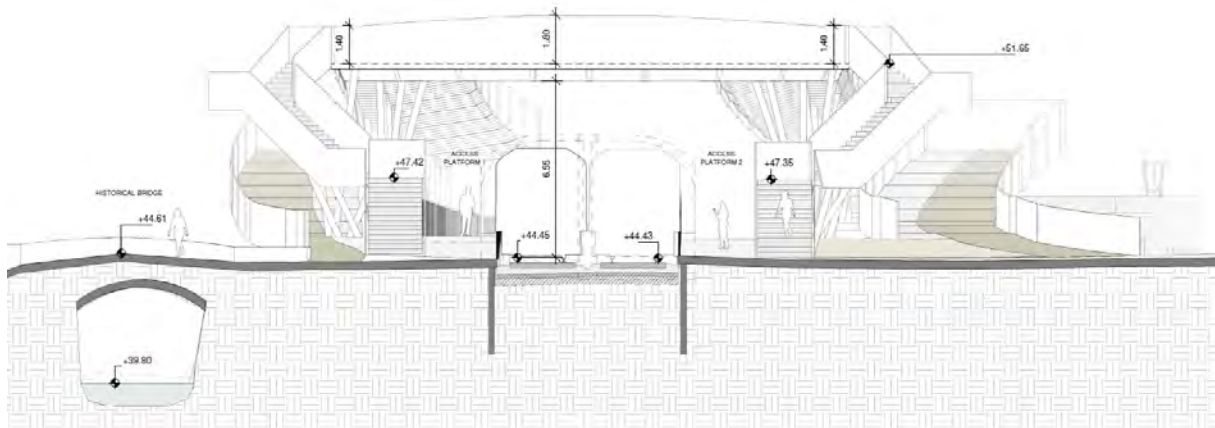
Variable parapet heights on proposed Ashtown footbridge
